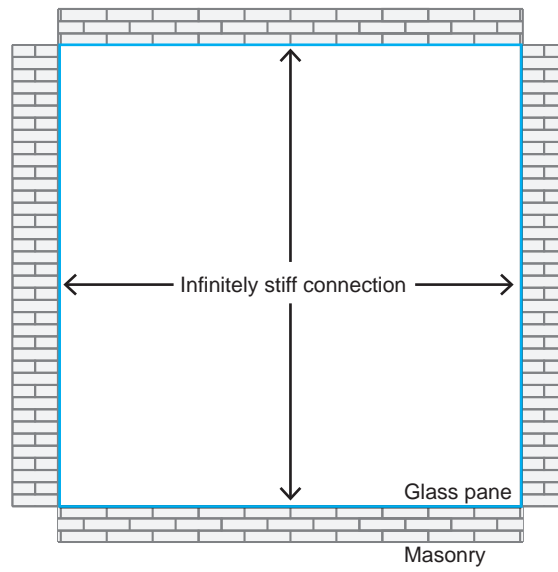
Superglue approach - rigid connection between masonry and glass pane. The structural adhesive and timber frame are not modelled.
